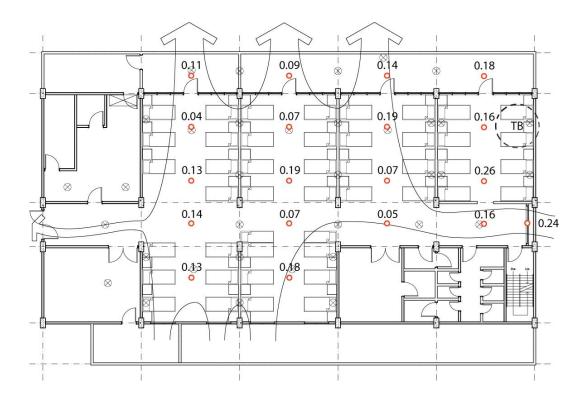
Floor plan and ventilation data of hospital E inpatient ward#3
